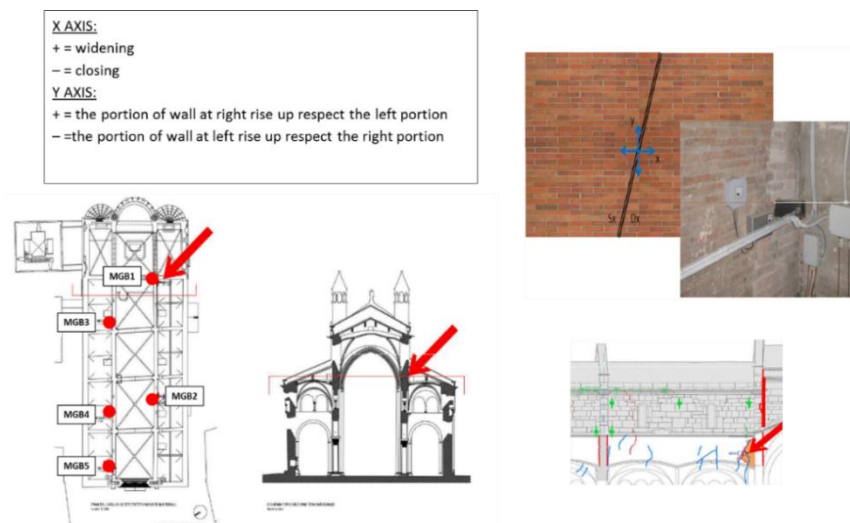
Biaxial joint meter installed in the central nave of the Cathedral (MGB1)
